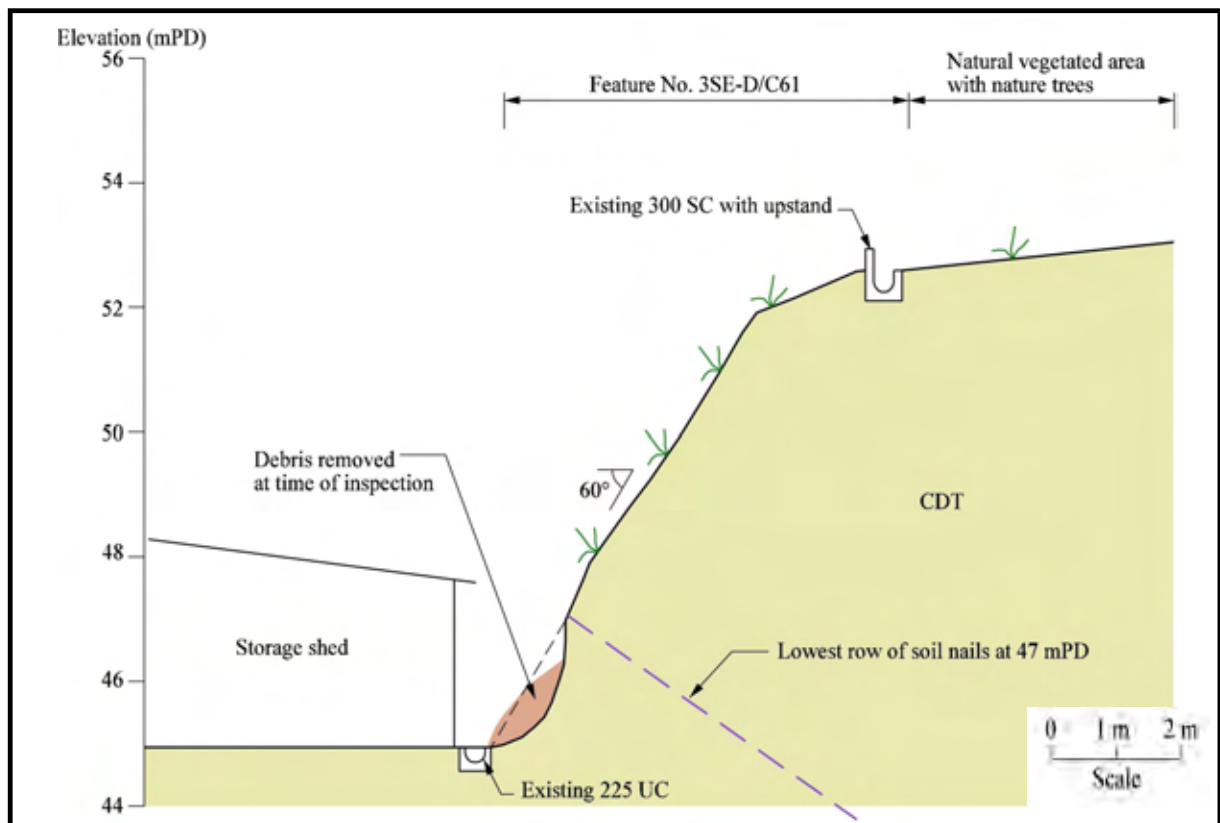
Cross Section A – A (Slope No. 3SE-D/C61)
